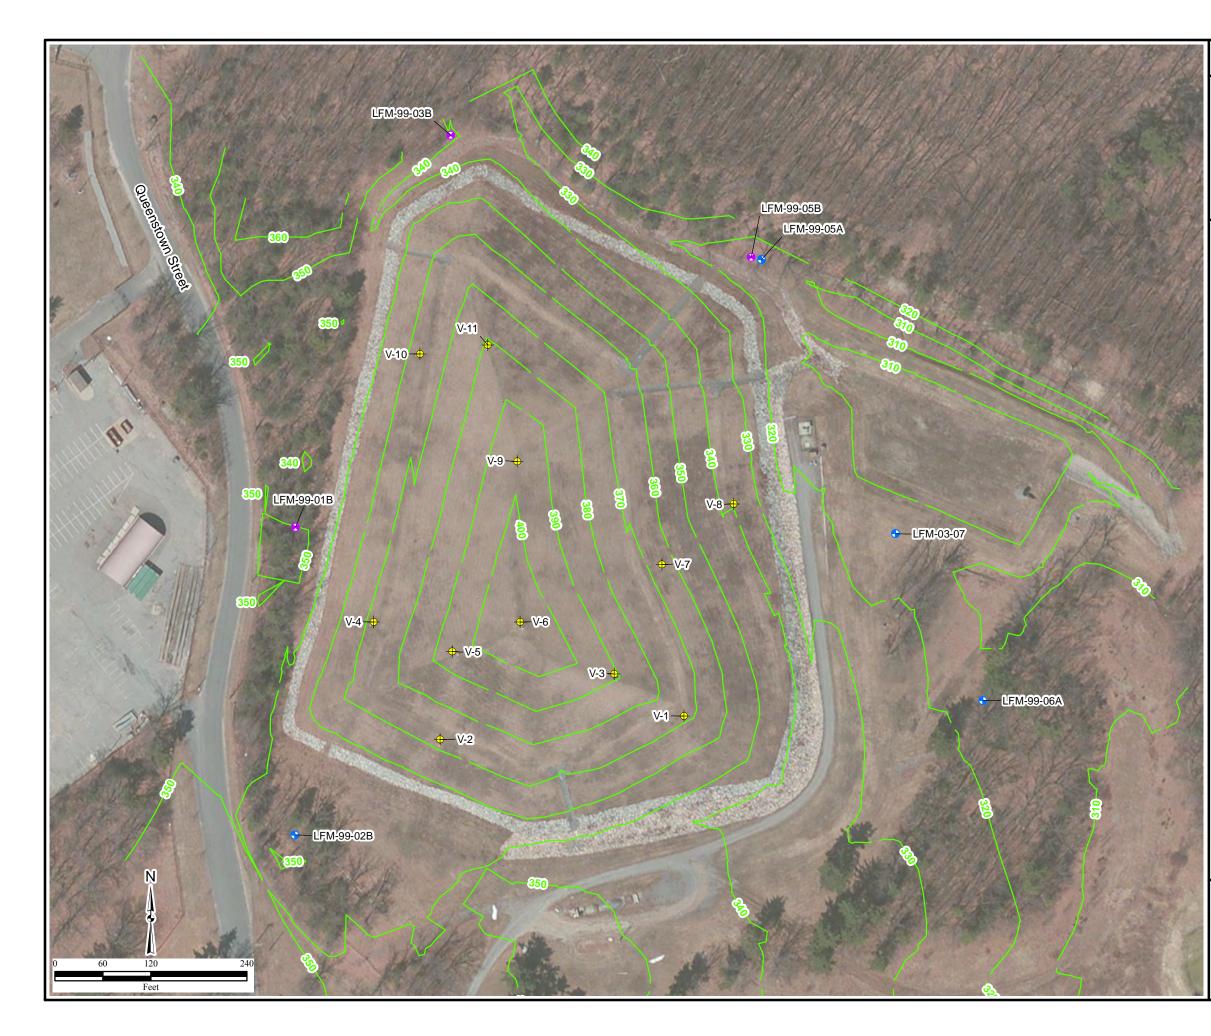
Site Layout Devens Consolidation Landfill
